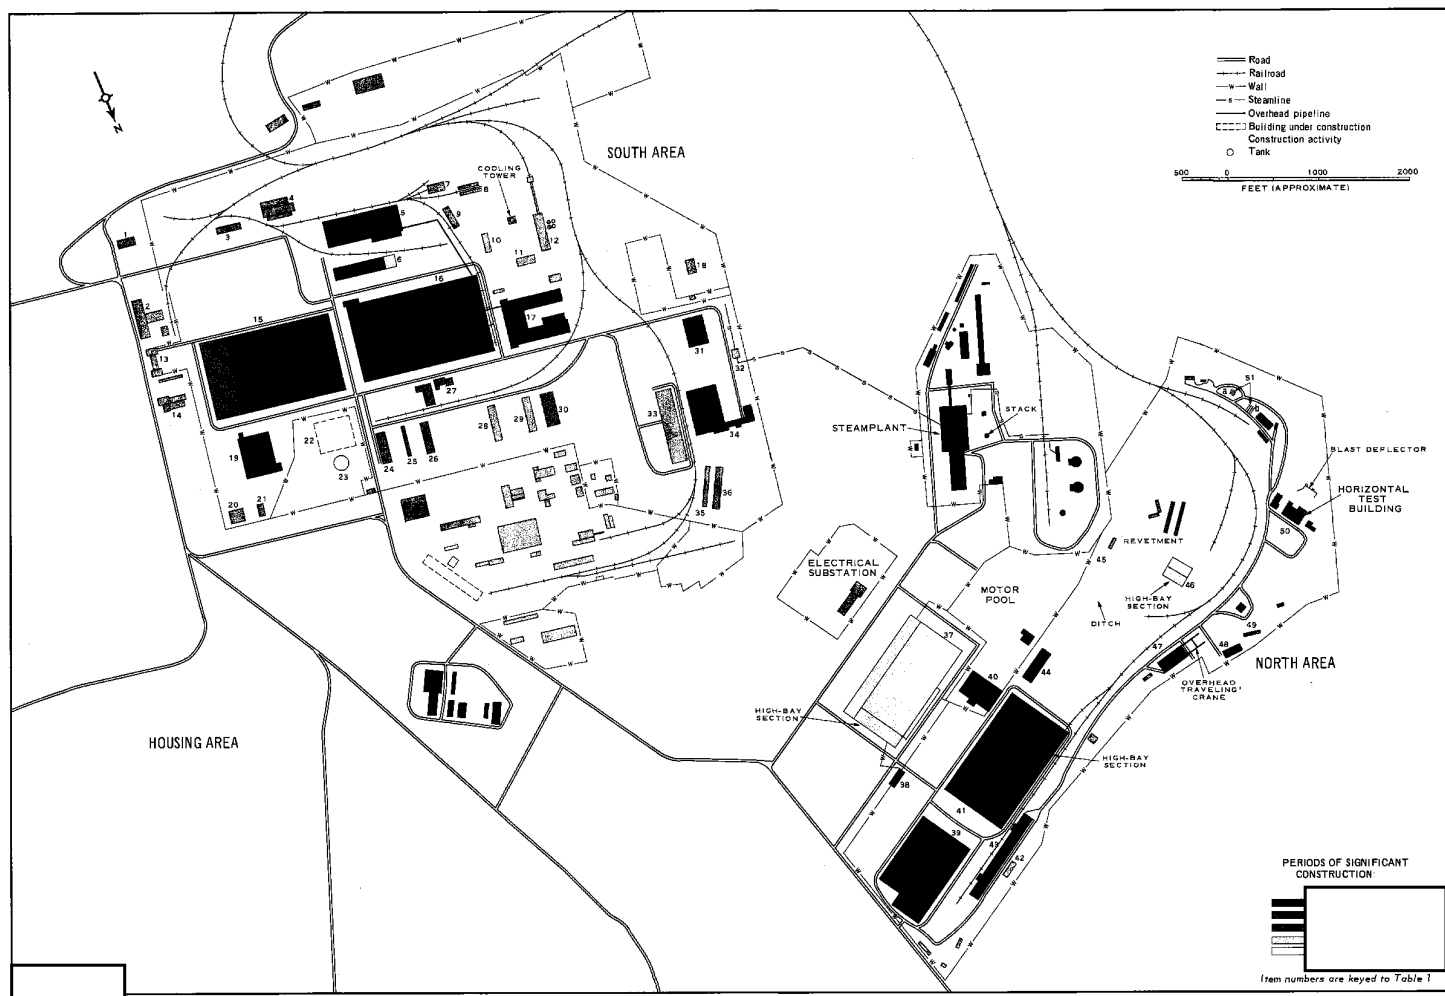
LAYOUT OF ARMAMENTS PLANT 66.
